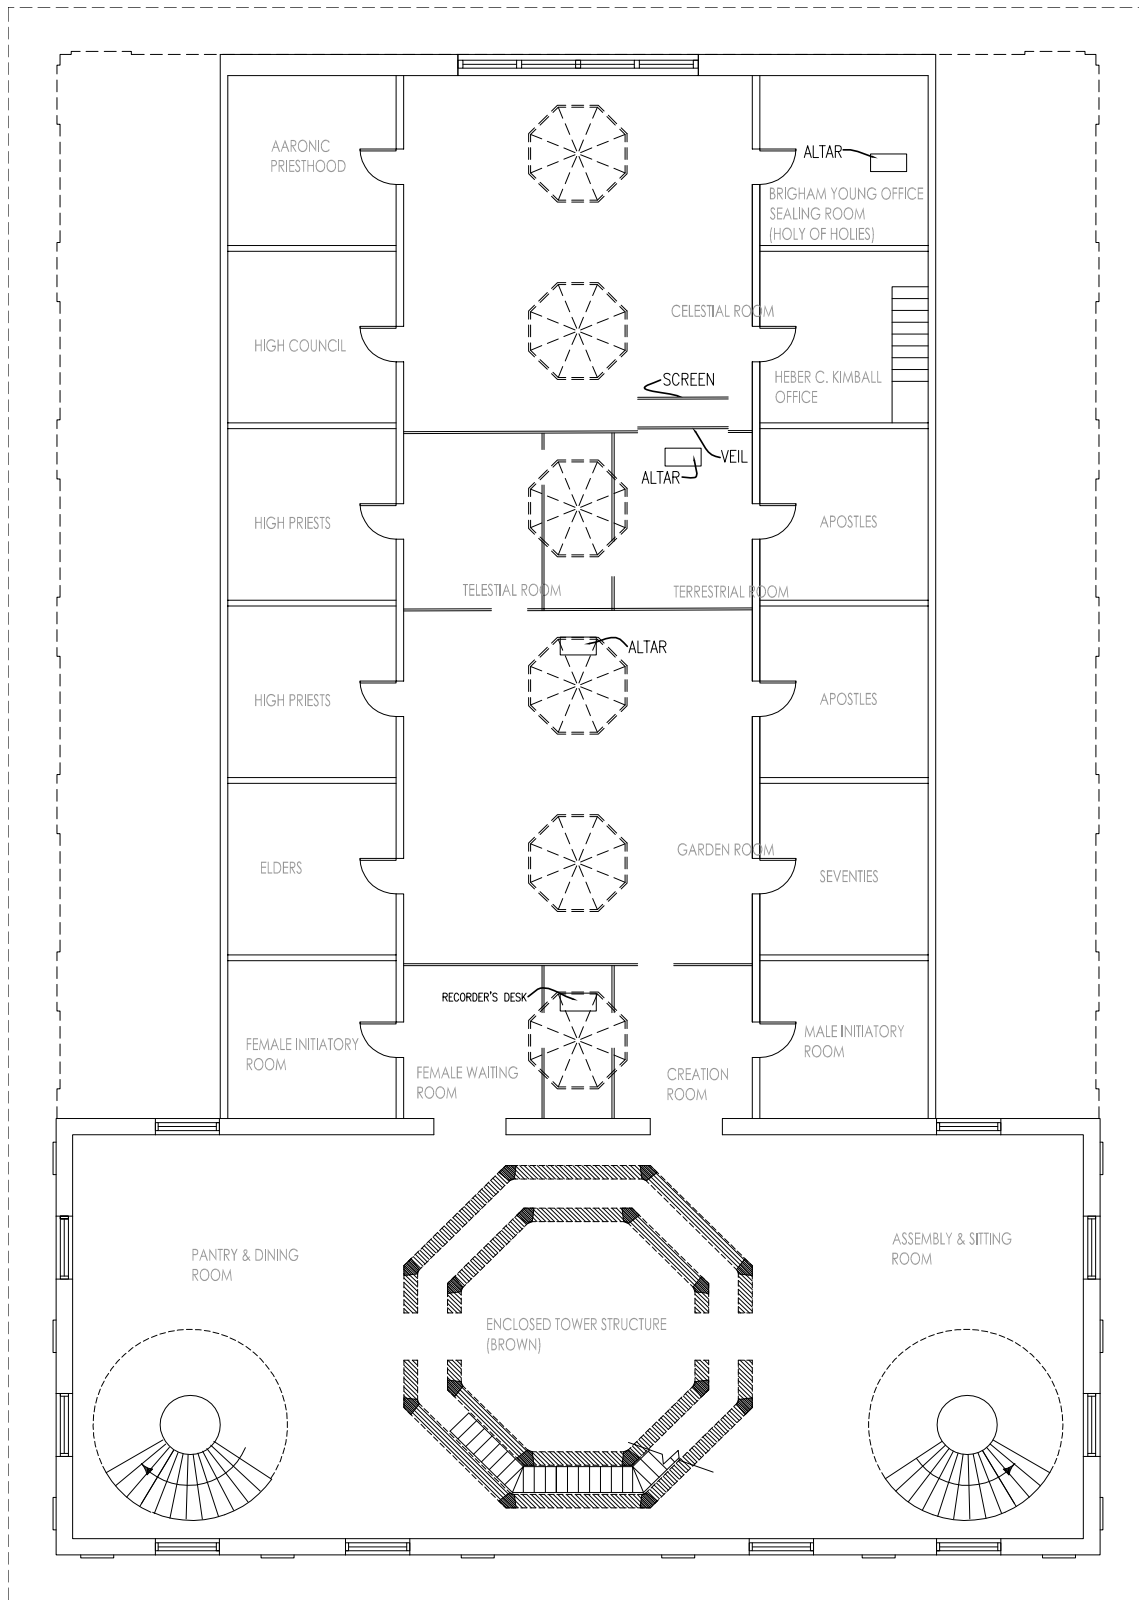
Attic floor plan based on Lisle Brown and FFKR Architects reconstruction drawings. Drawn by author.
